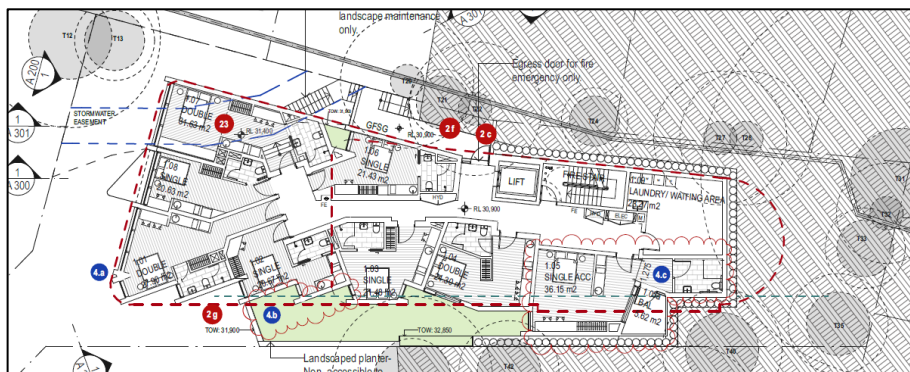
Proposed first floor plan (Source: TonkinZulaikhaGreer)
